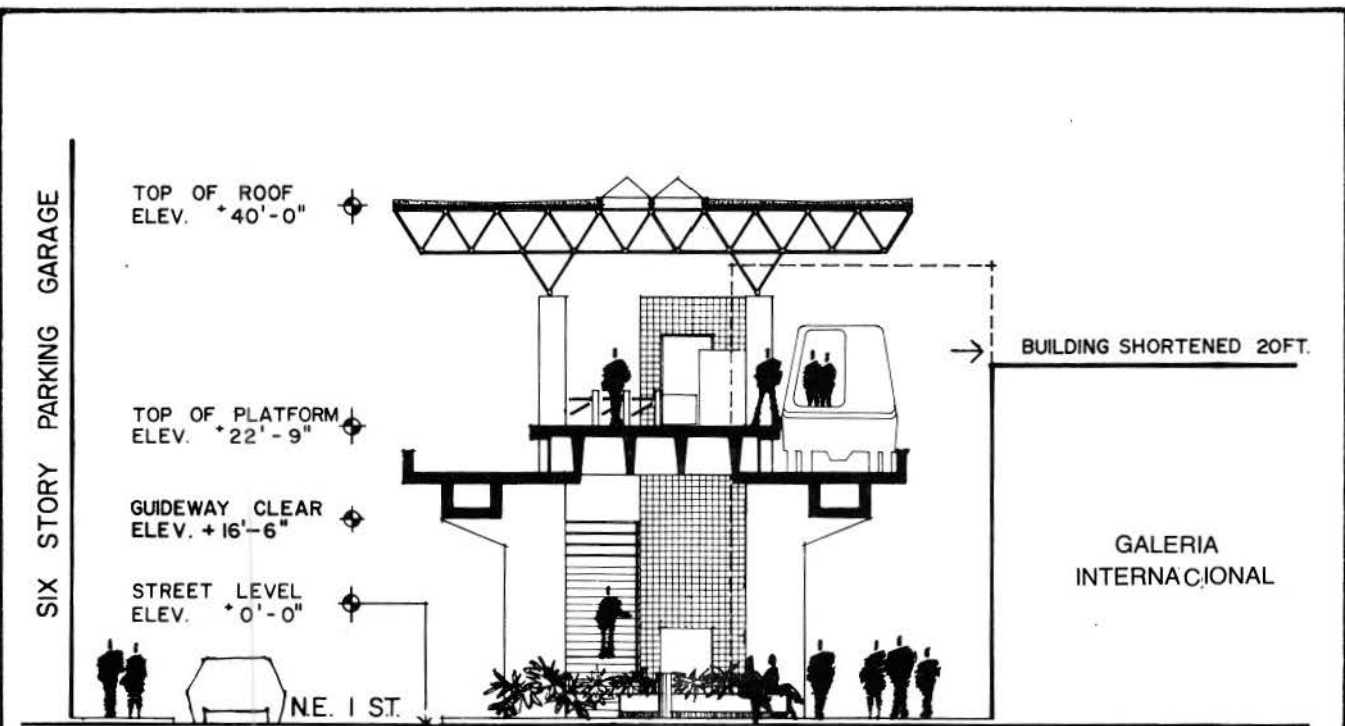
CROSS SECTION AT STATION 'P' LOOKING EAST
